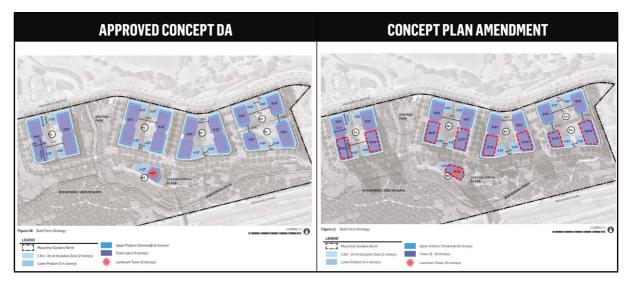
Location of Height of the Building Amendment (Source: URBIS 12 September 2024)
